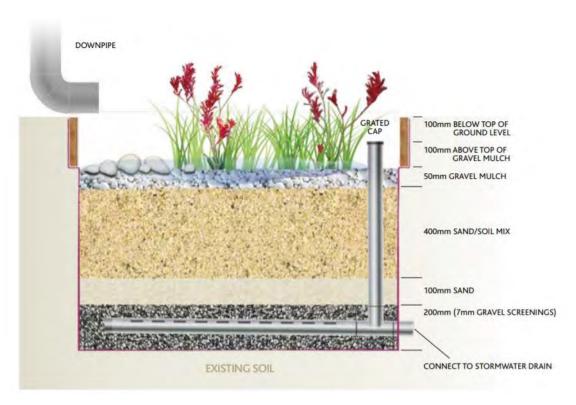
Example cross-sectional view of proposed inground raingarden (Source: Melbourne Water²)
